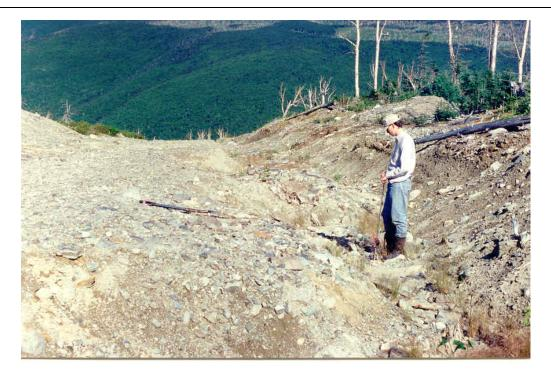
Recently constructed forest harvesting road, Redington Ridge, 8/22/1994. Photographer A.F.
